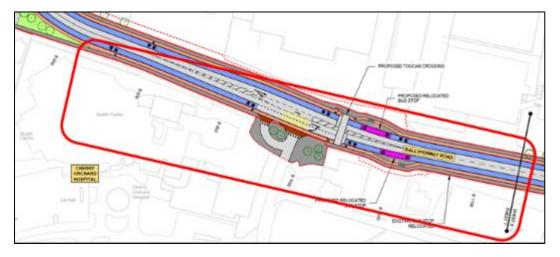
Proposed new Layout at Cherry Orchard Hospital
